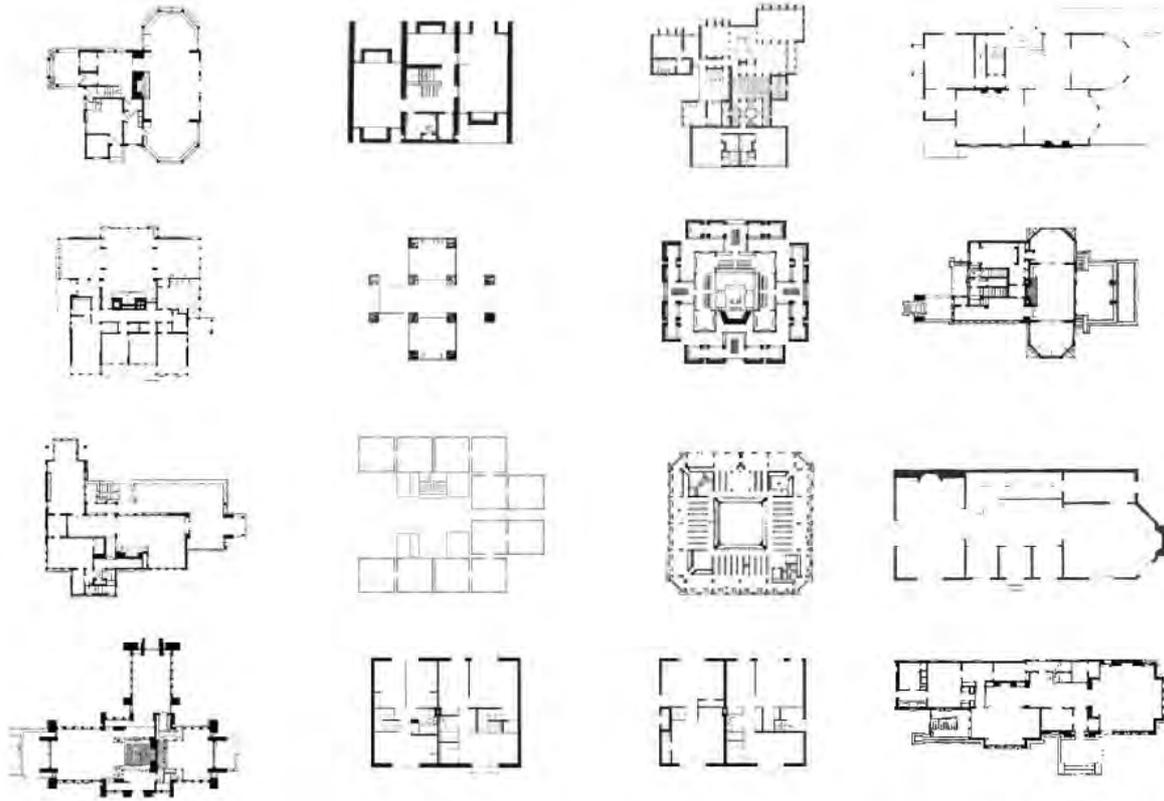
A sample of 16 floor plans from the full set of 54 plans by Palladio, Lloyd Wright and Khan (source: (Jupp, 2005))
